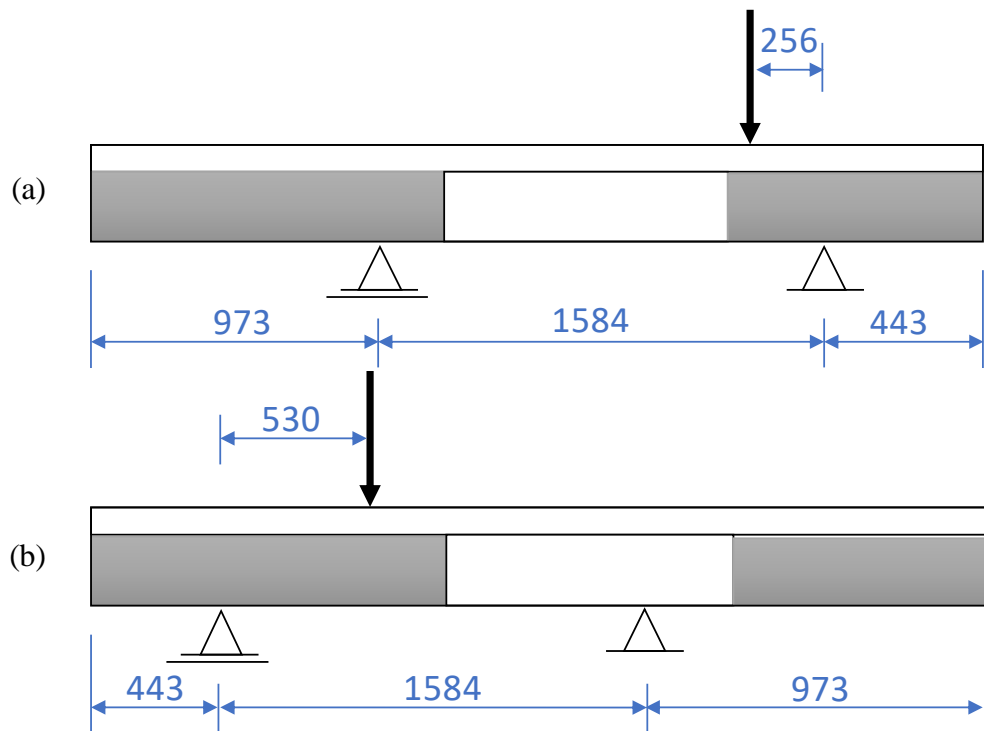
Test setup of Boushelham and Chaallal [65] study where (a) test on the deep beam, and (b) test on the slender beam. Dimensions in mm.
